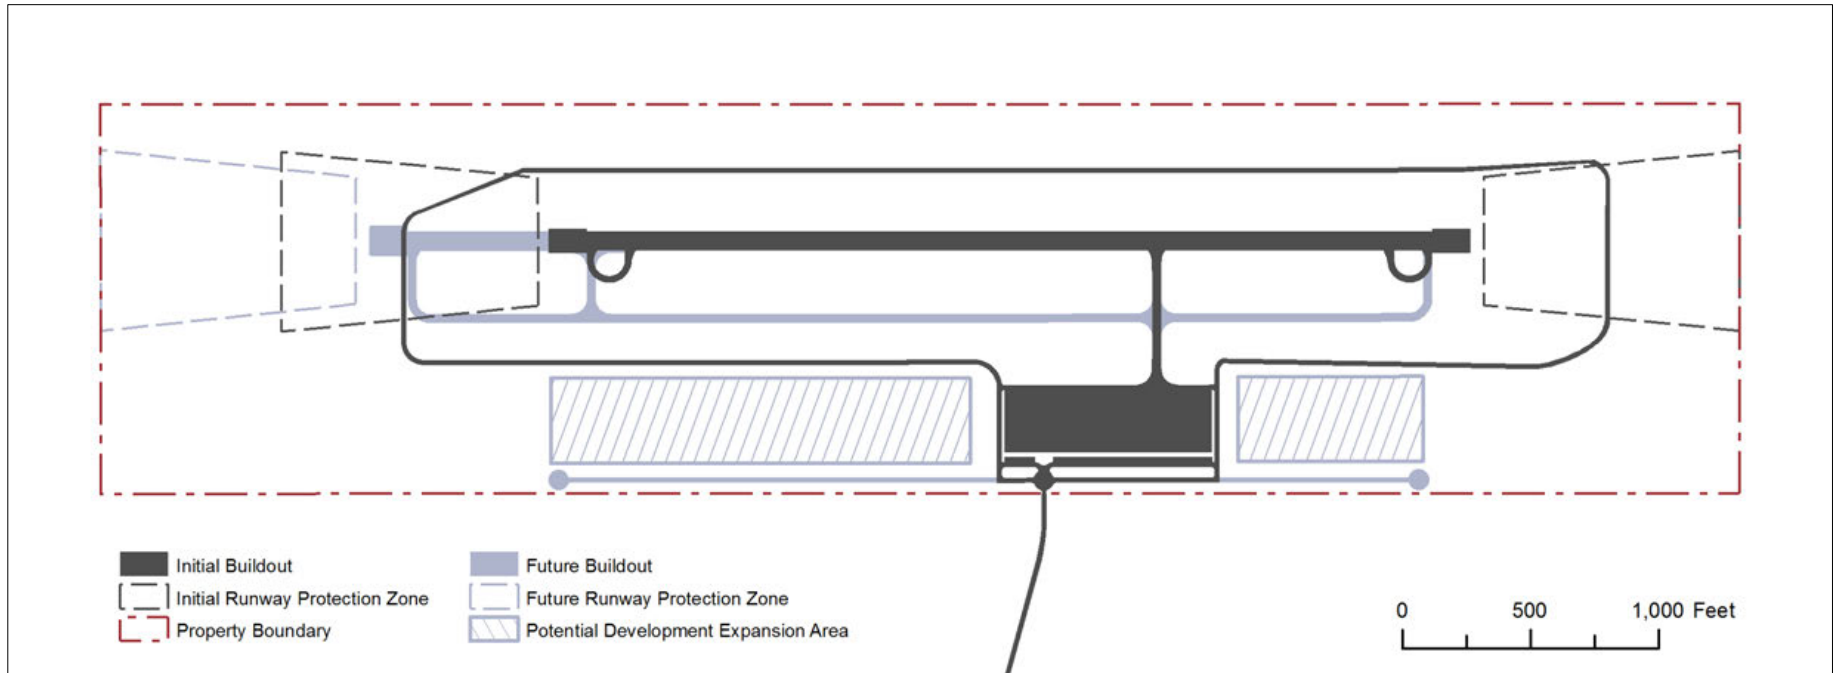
Conceptual layout of areas of initial airport buildout for a 3,300-foot runway, and potential future airport buildout for a 4,000-foot runway. *Note:* Both areas are subject to change based on actual design work, and future expansion to 4,000 feet would be subject to additional environmental review when proposed for construction.
